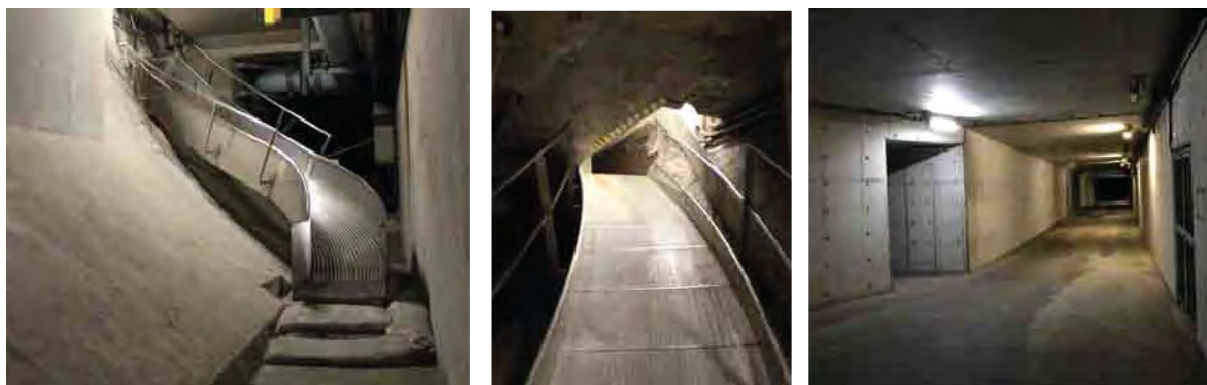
Escape facilities within the Tokyo Wan Aqua-line tunnel and wind towers (ventilation system)
